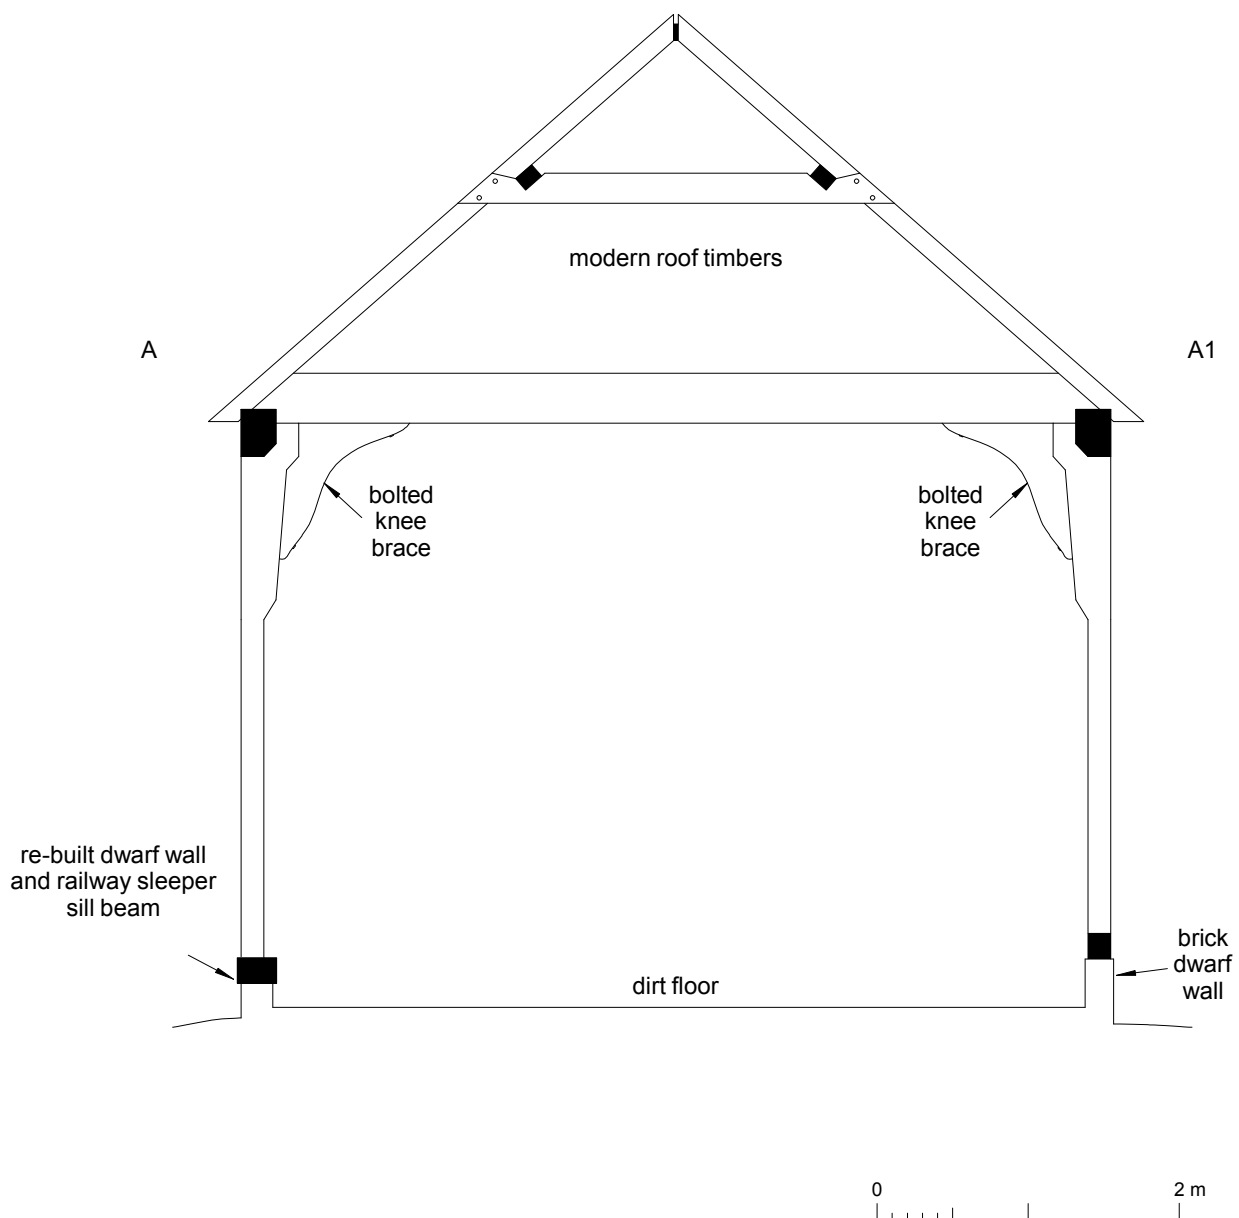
Barn 2, structure 2a: cross-section of truss A.
